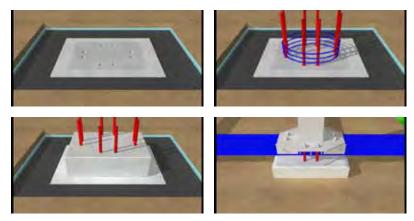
Structural connection between the Orchid House and existing building in Taipei
